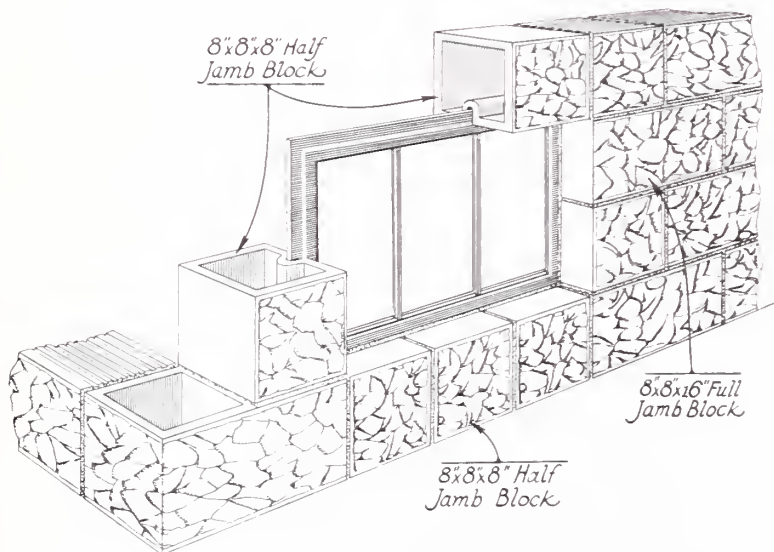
Hollow block jamb for steel sash, showing lintel and sill constructed of half jamb blocks
